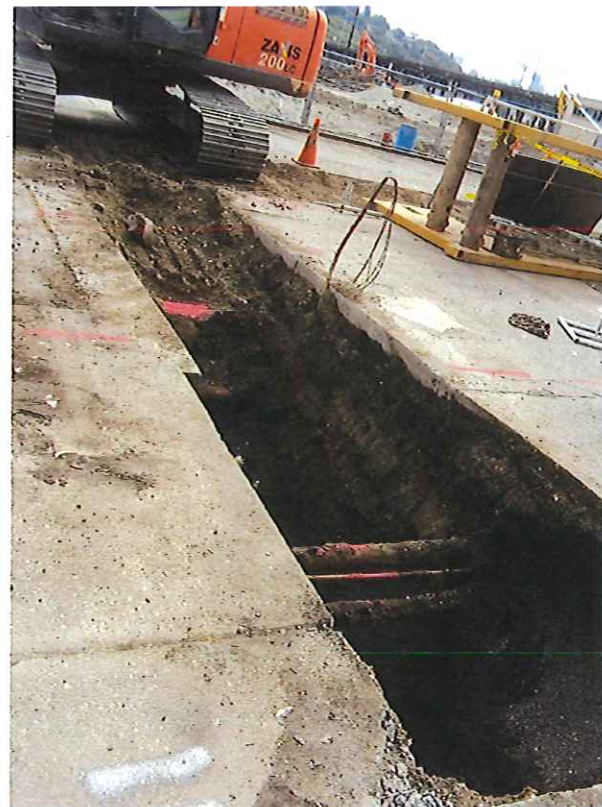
LOOKING SOUTHEAST TOWARD LNAPL RECOVERY TRENCH 5
